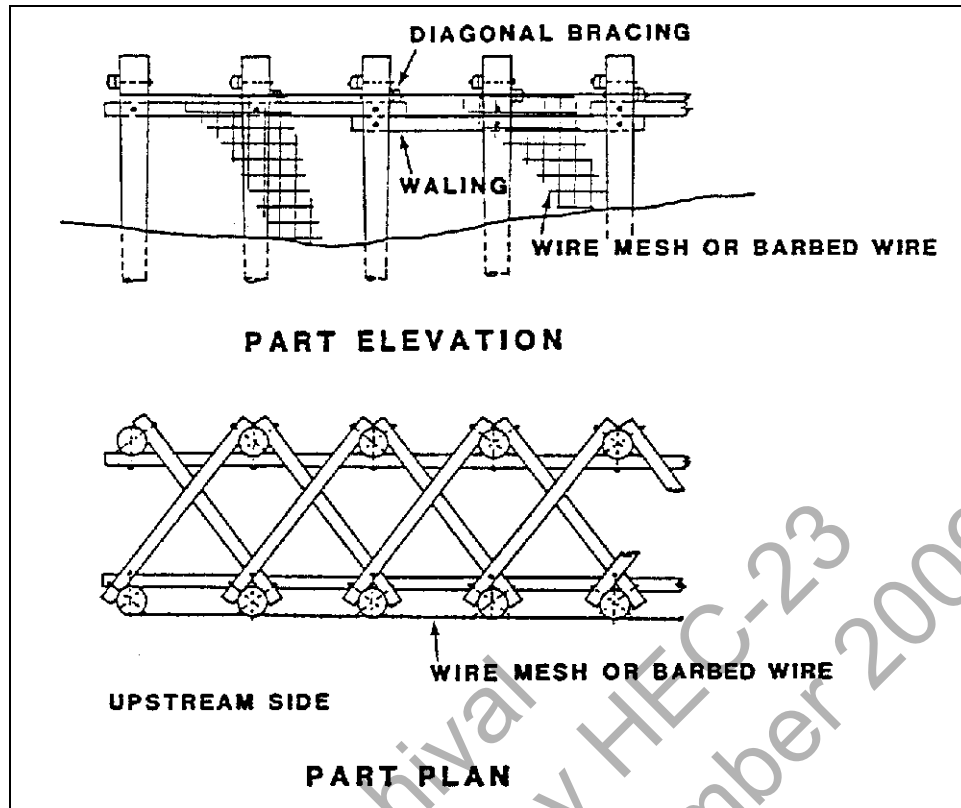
Timber pile bent retarder structure (Modified from California Department of Public Works, 1970 (after Brown).⁽²⁾)
